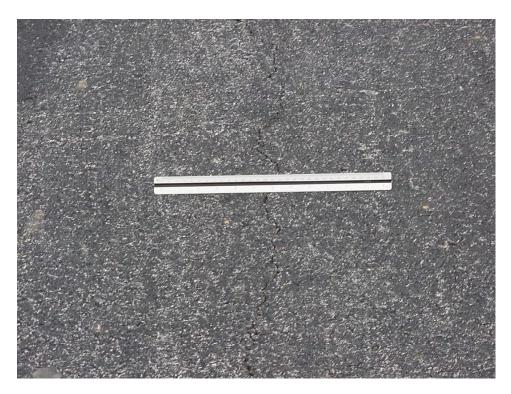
Perimeter Taxiway, Feature T6B, low-severity longitudinal crack
